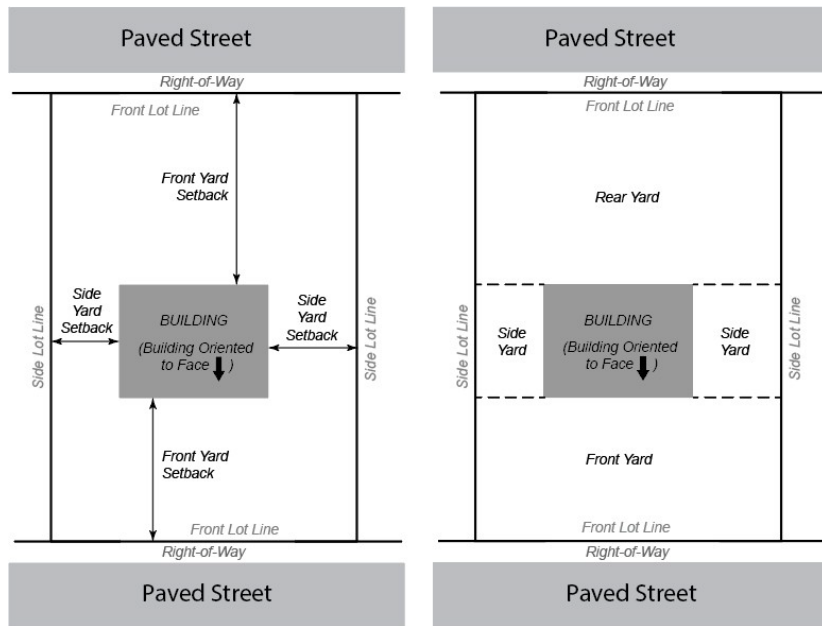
Typical lot lines and setback locations for a double frontage (through) lot (left image) and typical yard locations (right image). Please note the location of the rear yard for the purpose of accessory use location.
